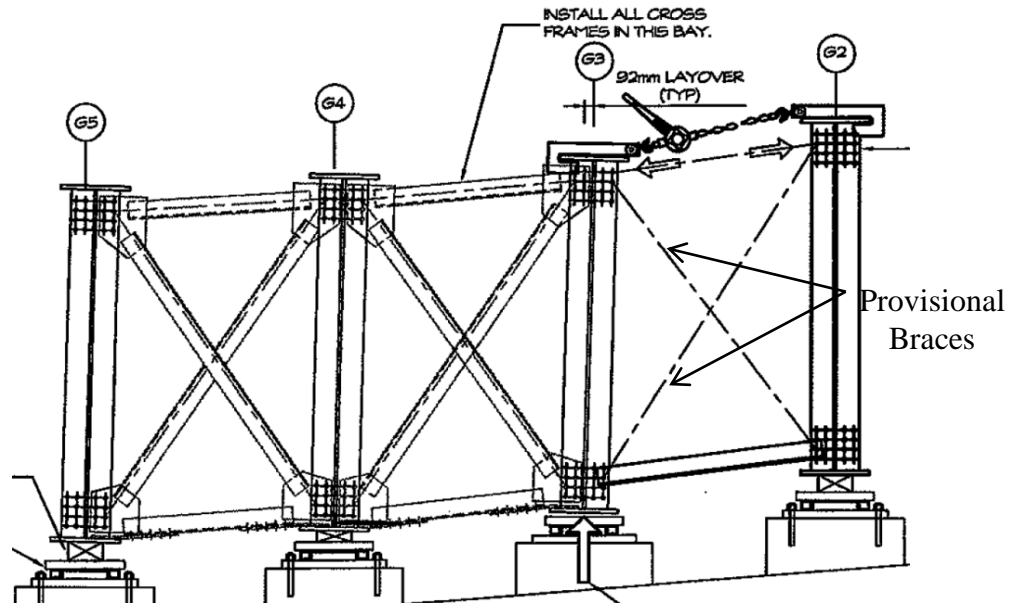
Schematic representation of the techniques used to control the position of the girders and connect the cross-frames in skewed bridges (Courtesy of Mr. Robert Cisneros, High Steel Structures, Inc.)
